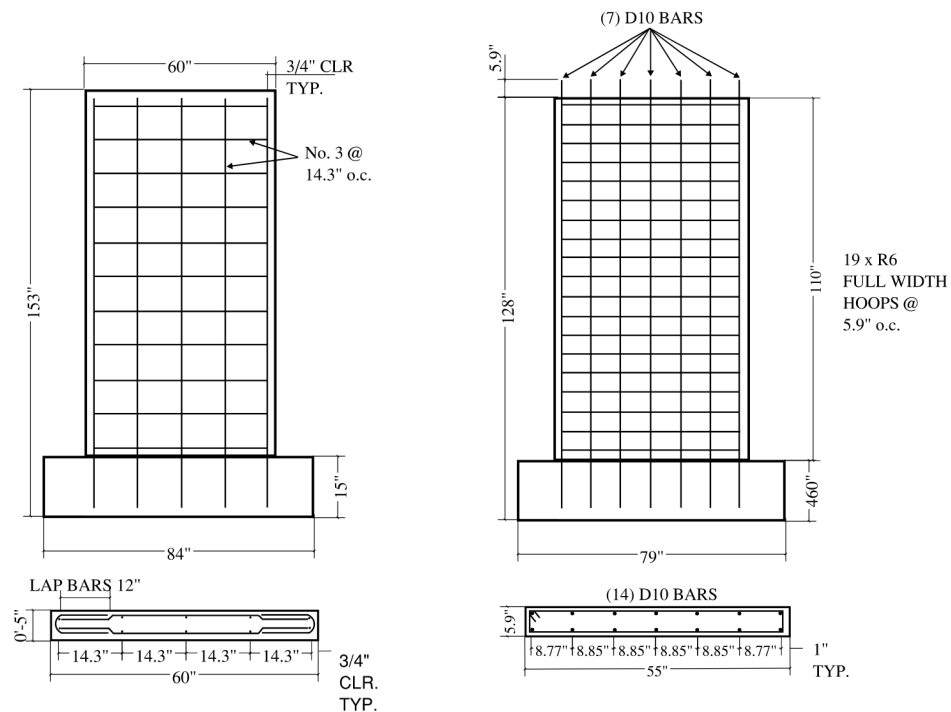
Wall Test Specimens (left) W1 and (right) C1-C3
